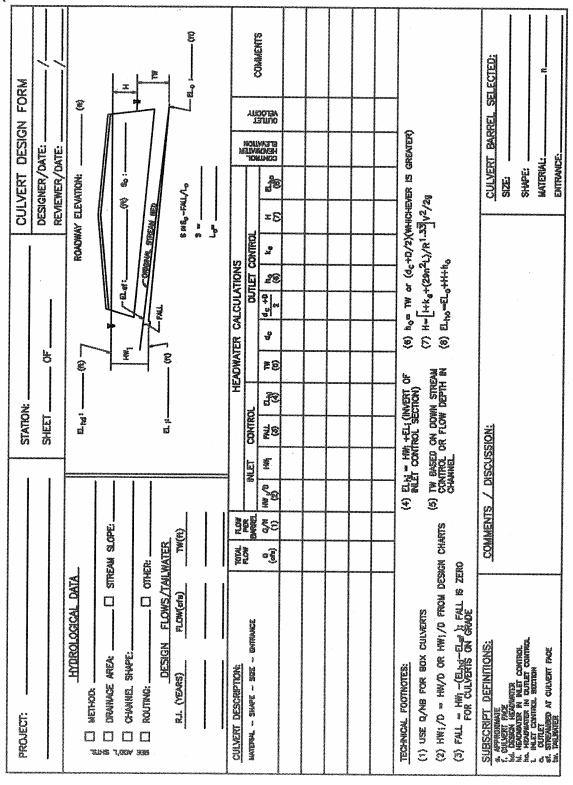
Culvert Design Worksheet (Blank) (Federal Highway Administration, HDS, No.5)
